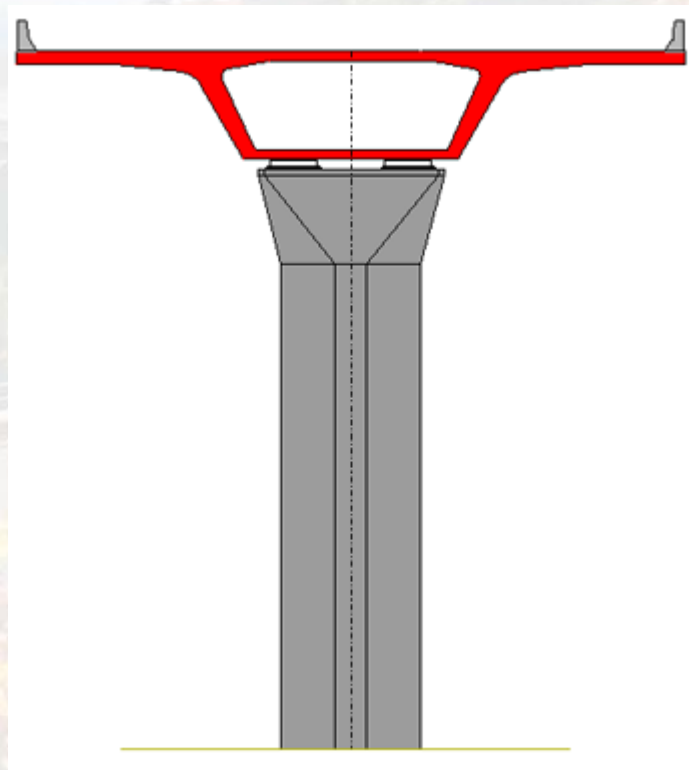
Possible Box Girder Bridge Superstructure Concept
